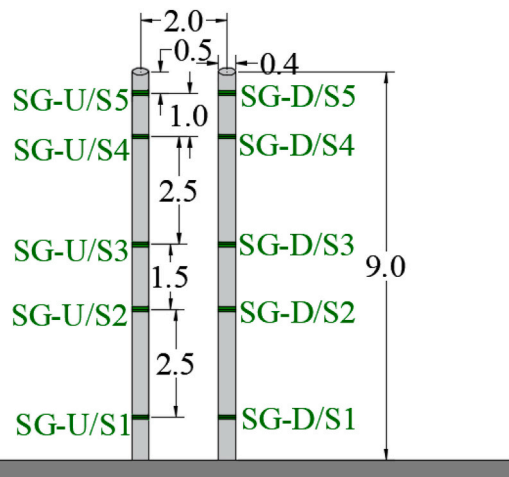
Pile layout (All dimensions are reported in meters in prototype scale).
